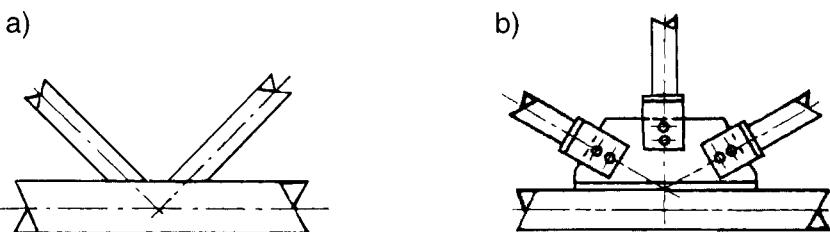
a) Welded and b) bolted truss joint
